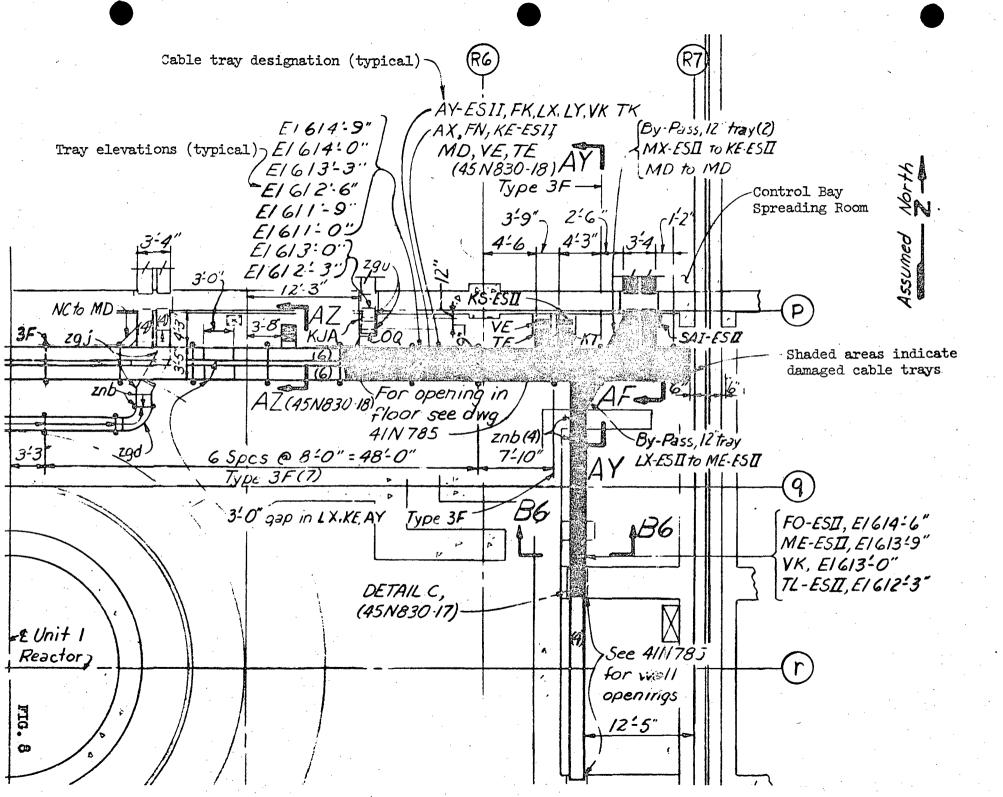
PART PLAN VIEW OF CABLE TRAYS FIGURE 9 CABLE TRAY SINGLE LINE
